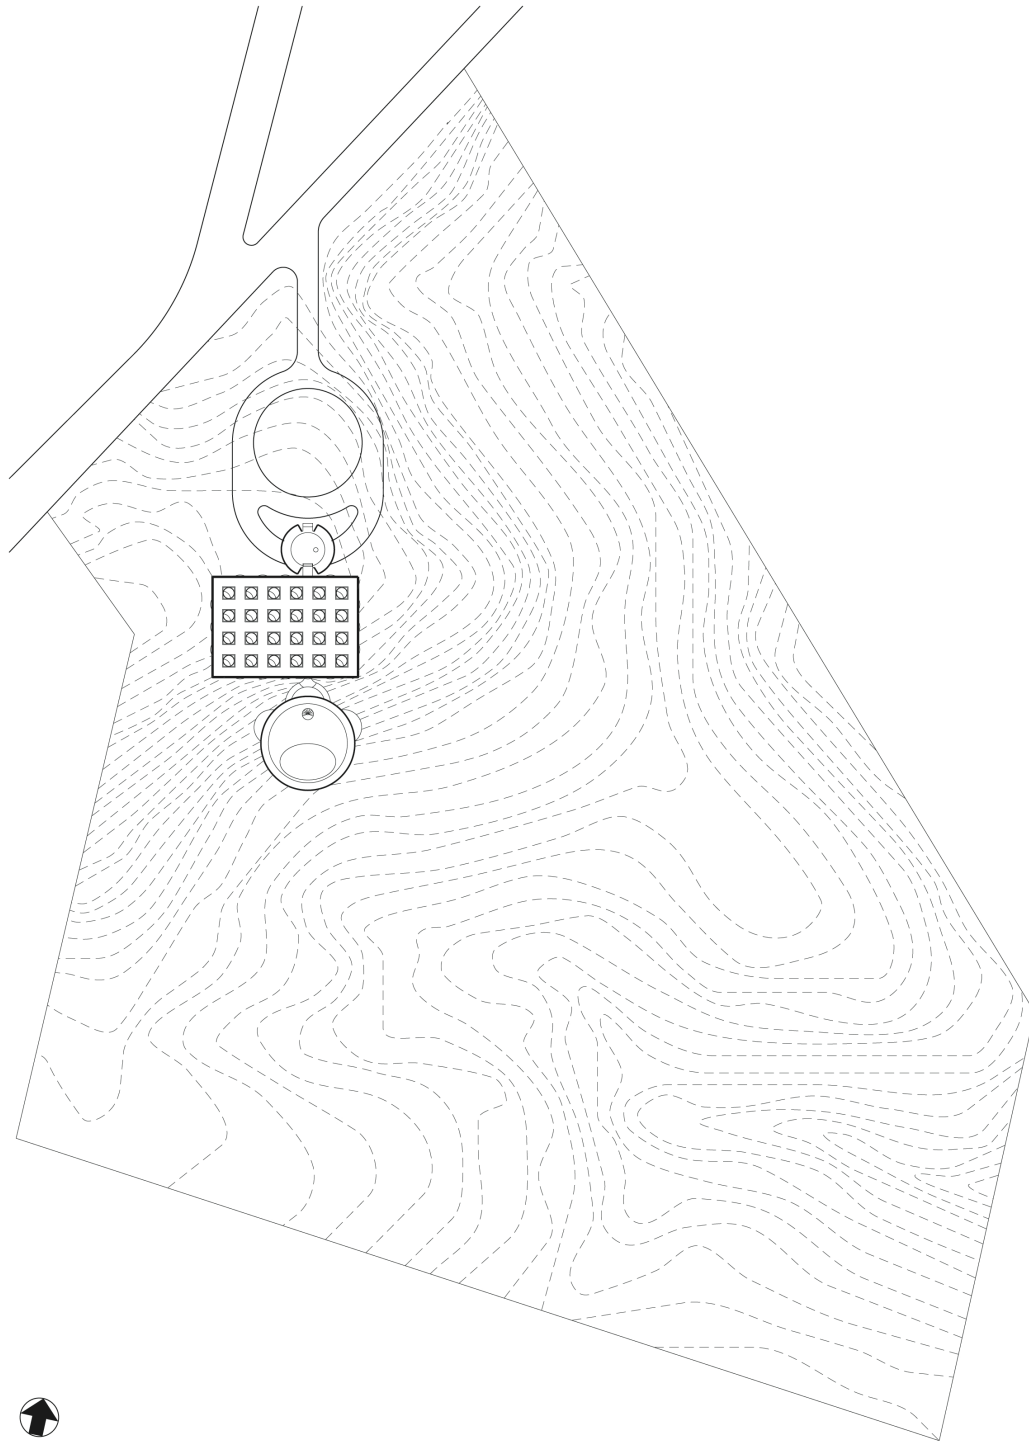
Overall Site Plan. The house is sited on the northern part of the lot to take advantage of an elevation that offers views to Atlanta's skyline to the south. From north to south, the plan shows the entry drive, front lawn, entry bridge and carport, main house, and back pavilion with rooftop swimming pool.
